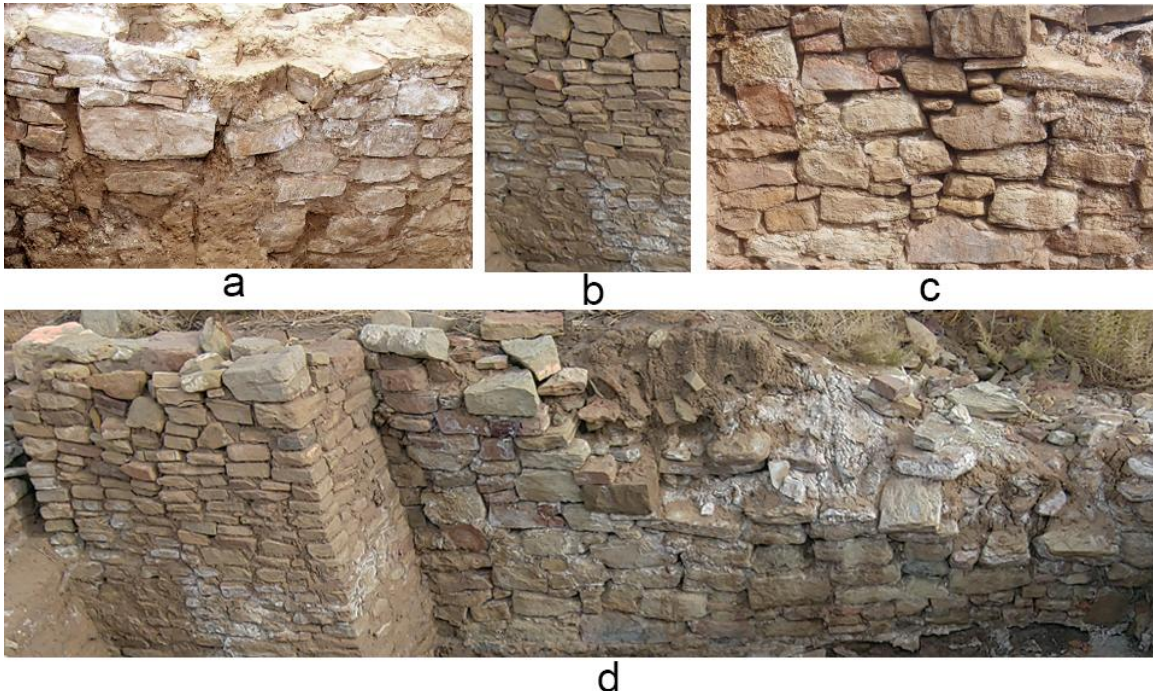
Type 3b masonry. a) exterior face of Kiva 31 enclosing wall; b) Kiva 31 ventilator shaft; c) interior face of Room 30 west wall; d) overview of Kiva 31 south wall.
